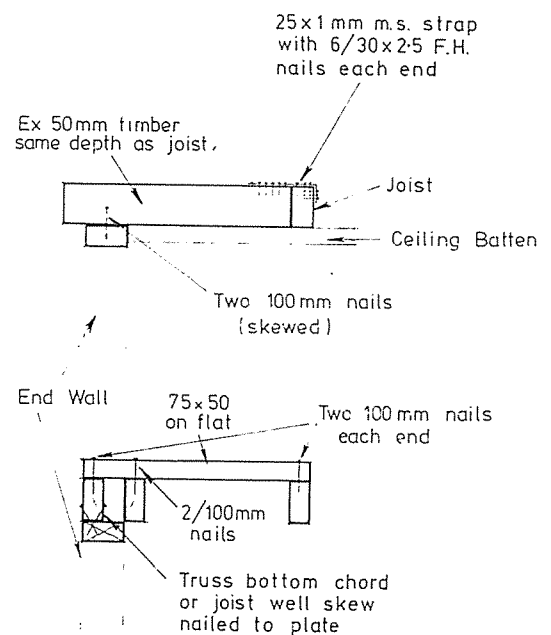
Connecting members providing lateral support to the top plates of external walls
